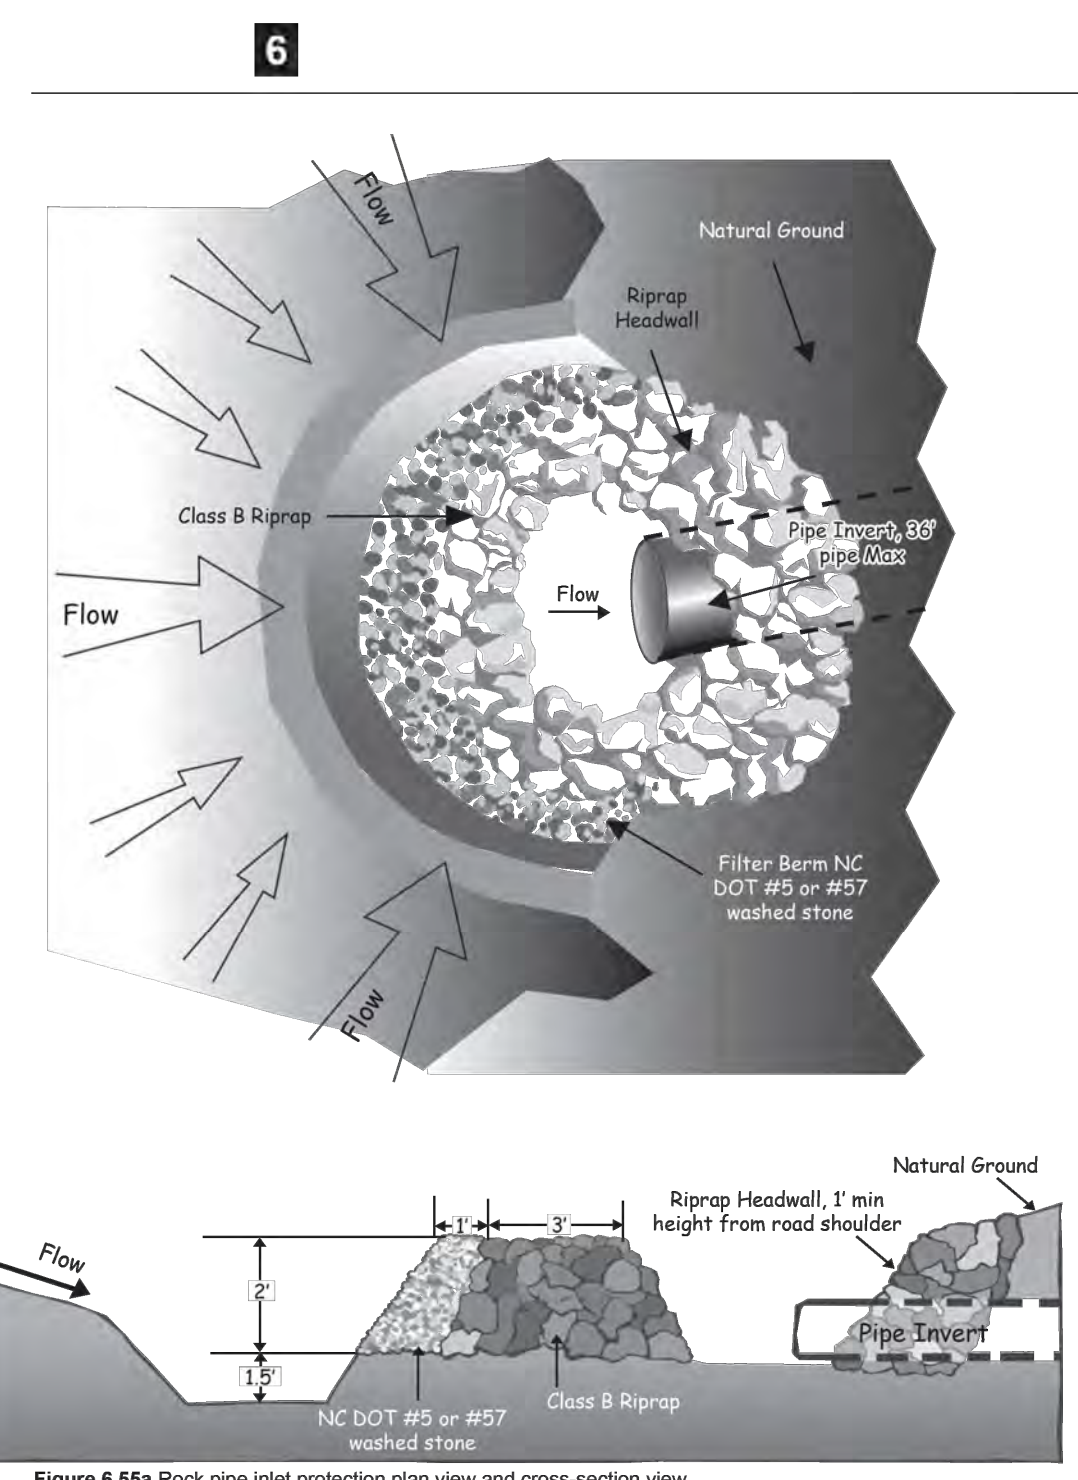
Rock pipe inlet protection plan view and cross-section view
